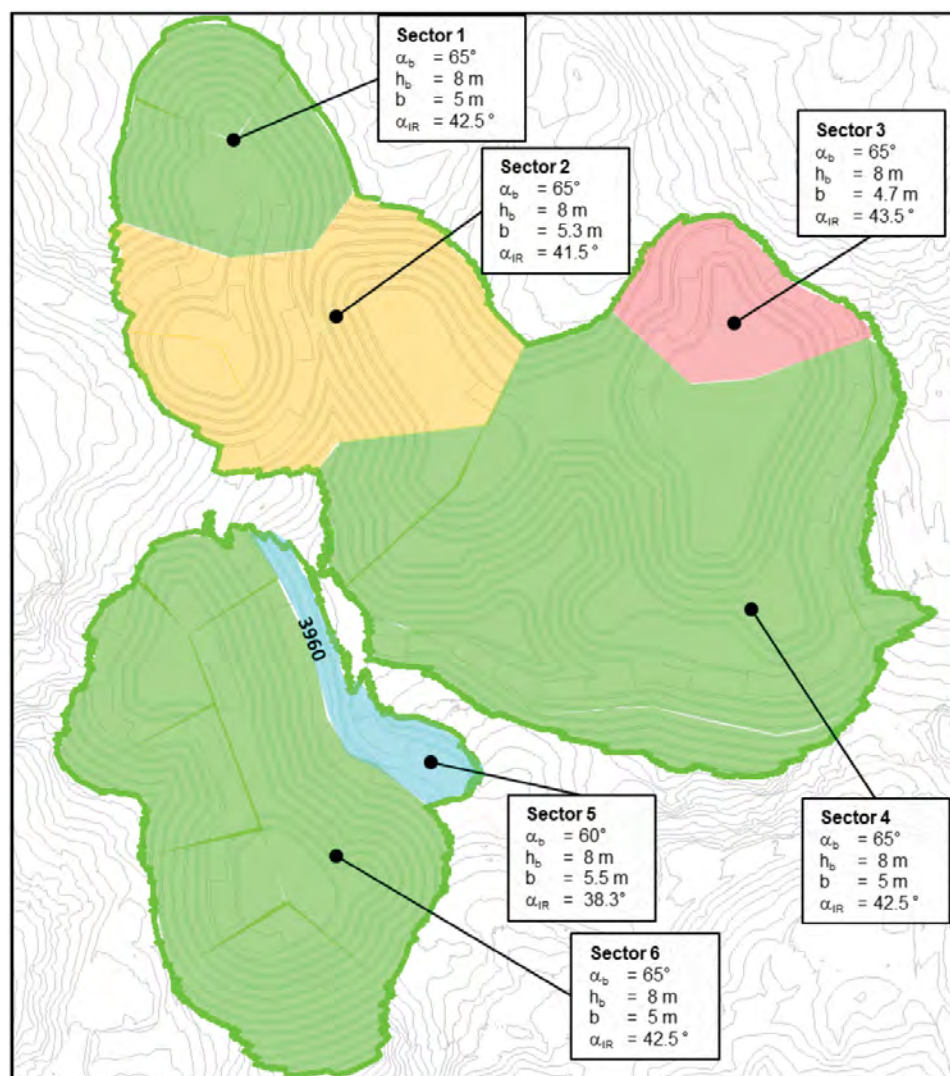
Geotechnical recommendations for Tantahuatay 2 EXT NW open pit design
